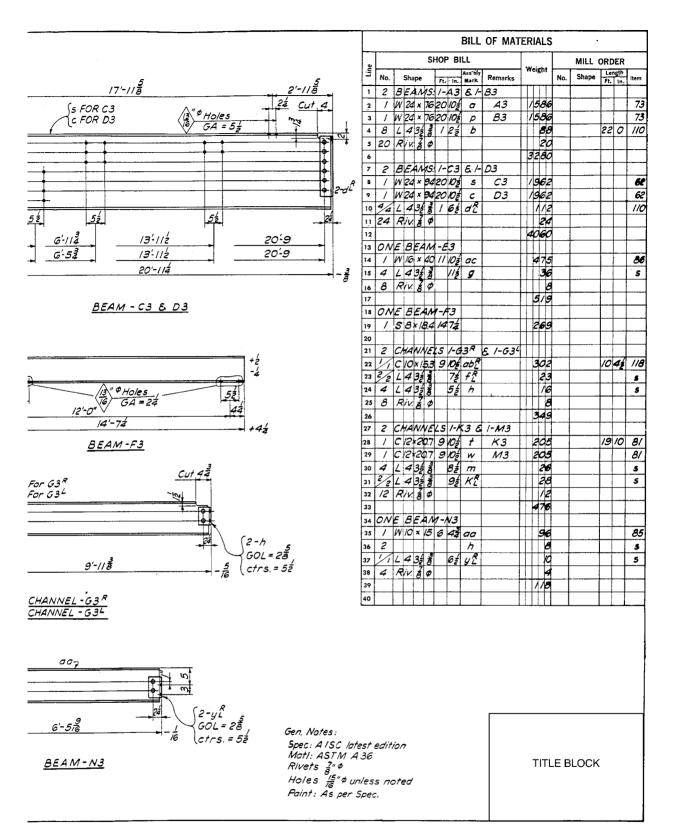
Typical fabrication details for a beam (AISC practice)
